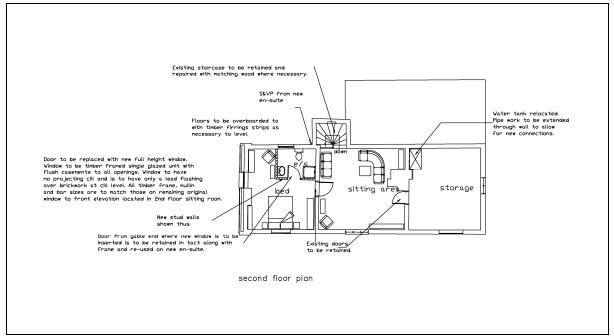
Outline development proposals (supplied by Hayward Architects, not to scale)
